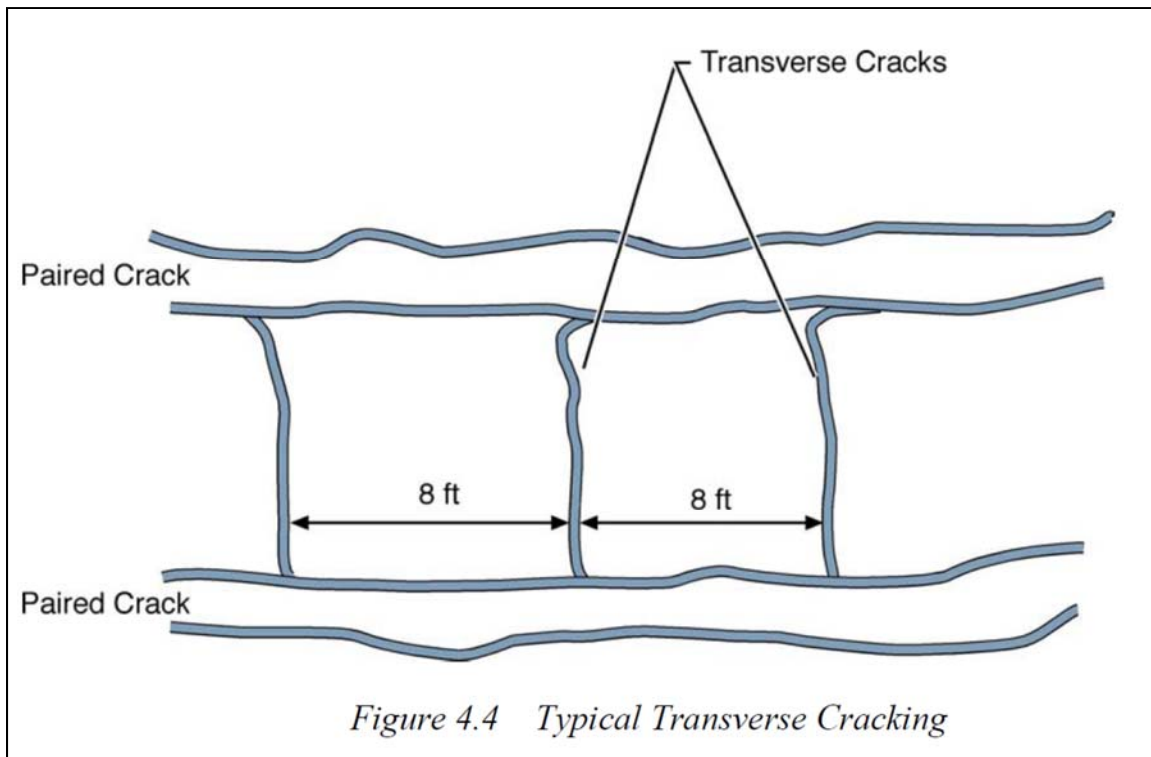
Typical transverse cracking on Dow Barge Canal Bridge (Folliard, Smith, Sellers, Brown & Breen, 2003).
